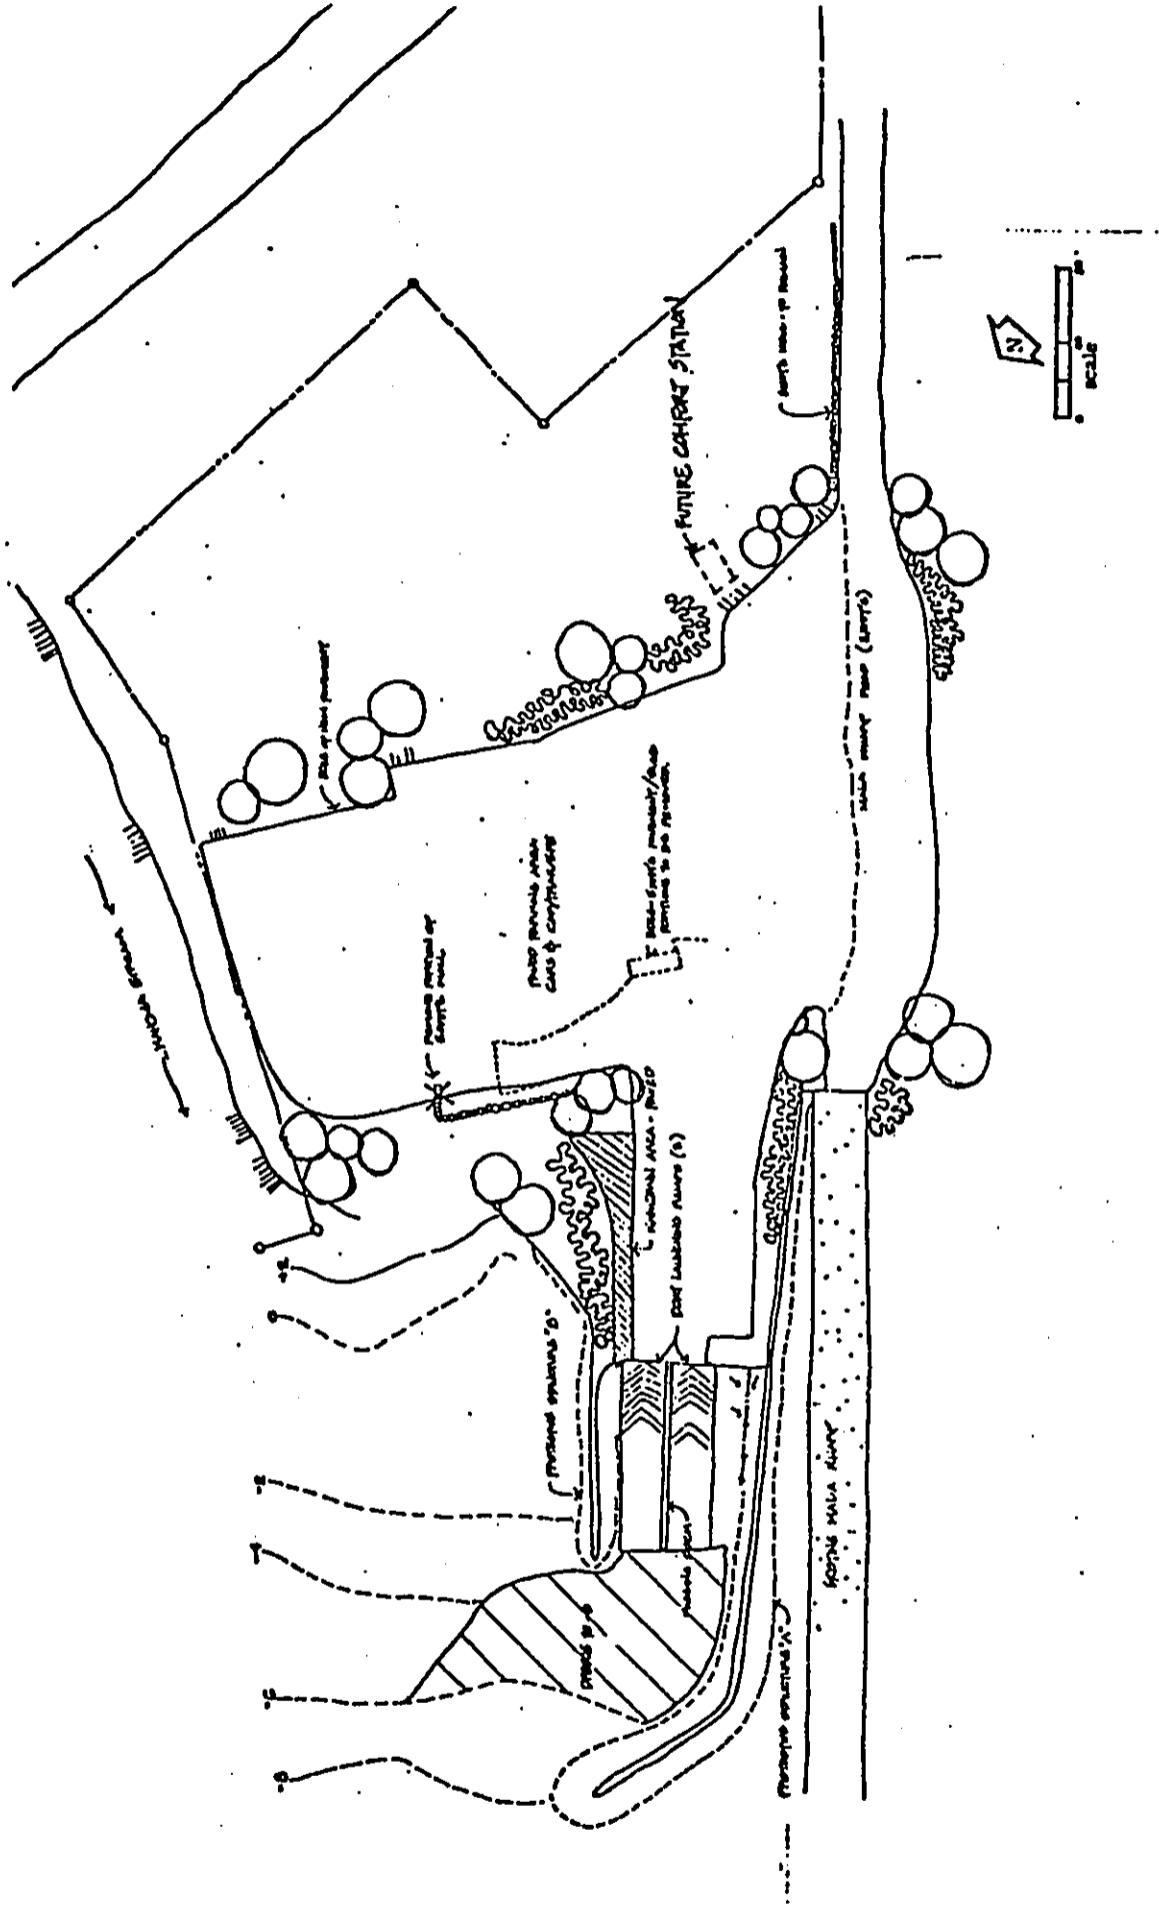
shows one concept for the facility. Other options and desirable amenities are discussed in the section on Alternatives.
